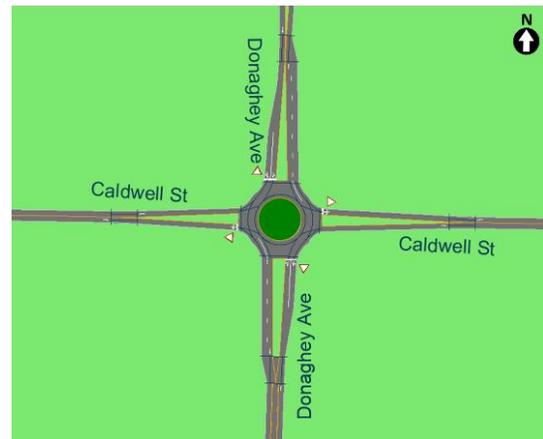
Donaghey Avenue at Caldwell Street Roundabout
